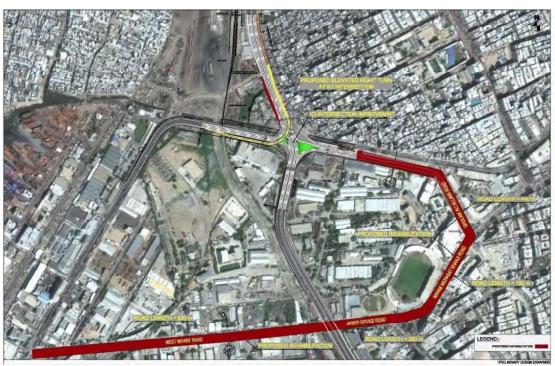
Layout Plan of Road Rehabilitation for the proposed project
